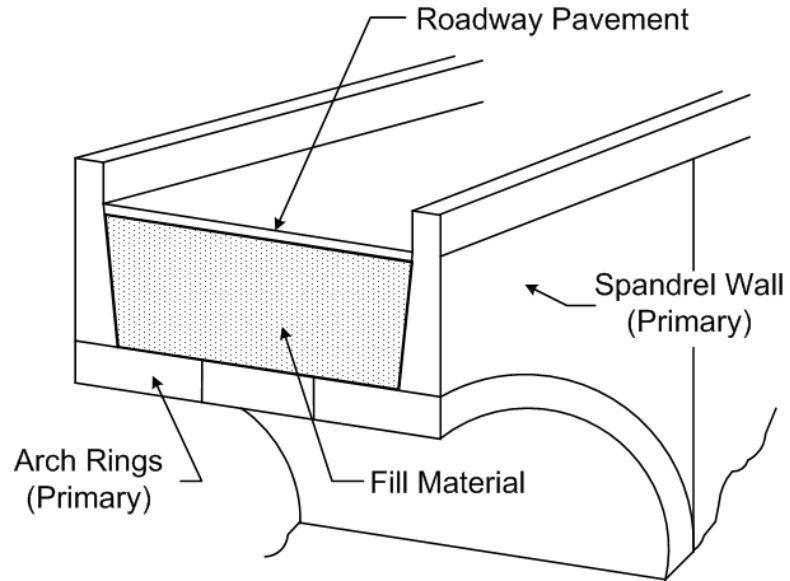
Primary Members of a Closed Spandrel Arch
